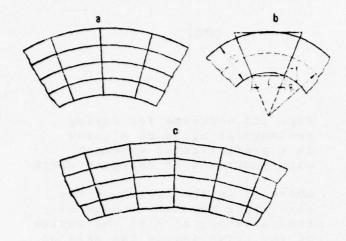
Scheme for laying the prefabricated pavements on curves: a-from slabs with two curvilinear grains; b-scheme for determining the necessary widening of the pavement from trapezoidal slabs; c-from slabs with a trapezoidal shape.
